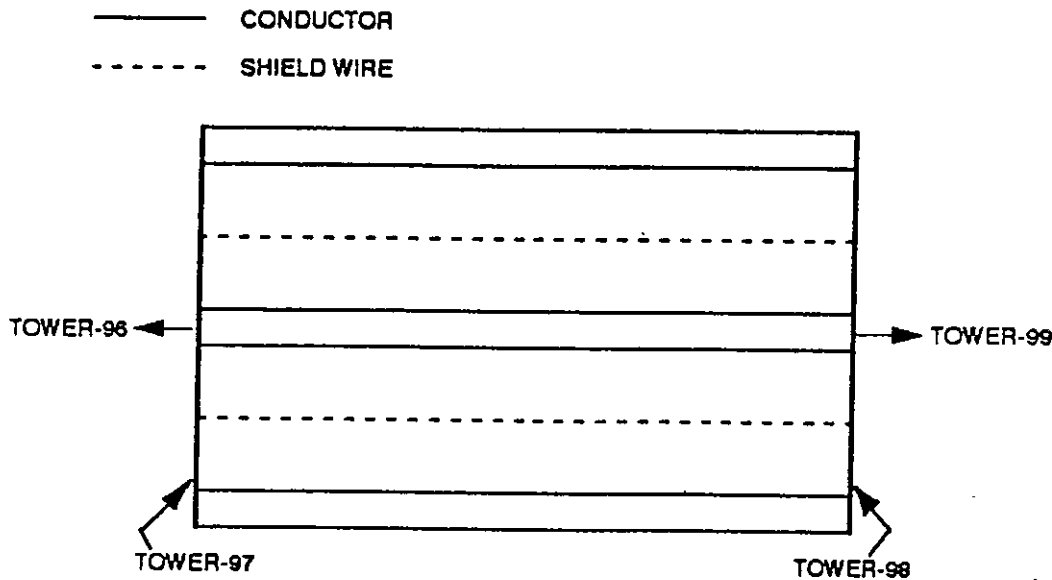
Plan view of a typical span of conductors and shield wires.
